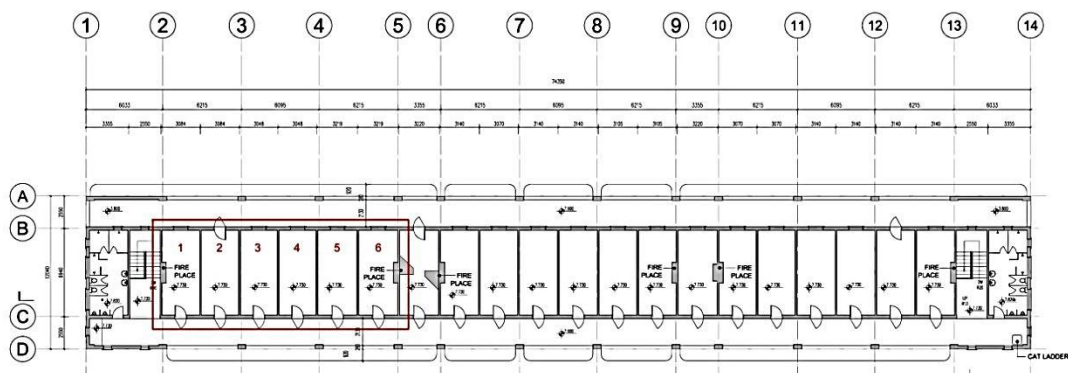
The existing second floor plan of Block 3, drawn by Hannah LIU.
